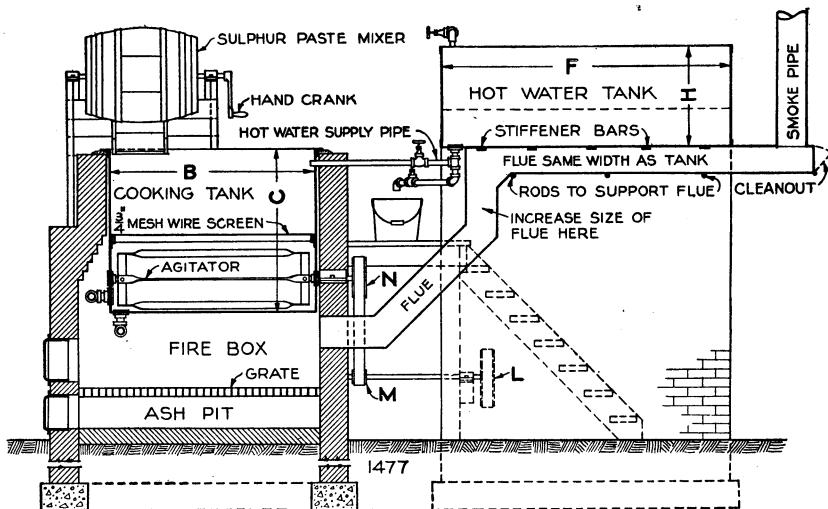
Sectional view of single-cooker furnace type of lime-sulphur plant.
